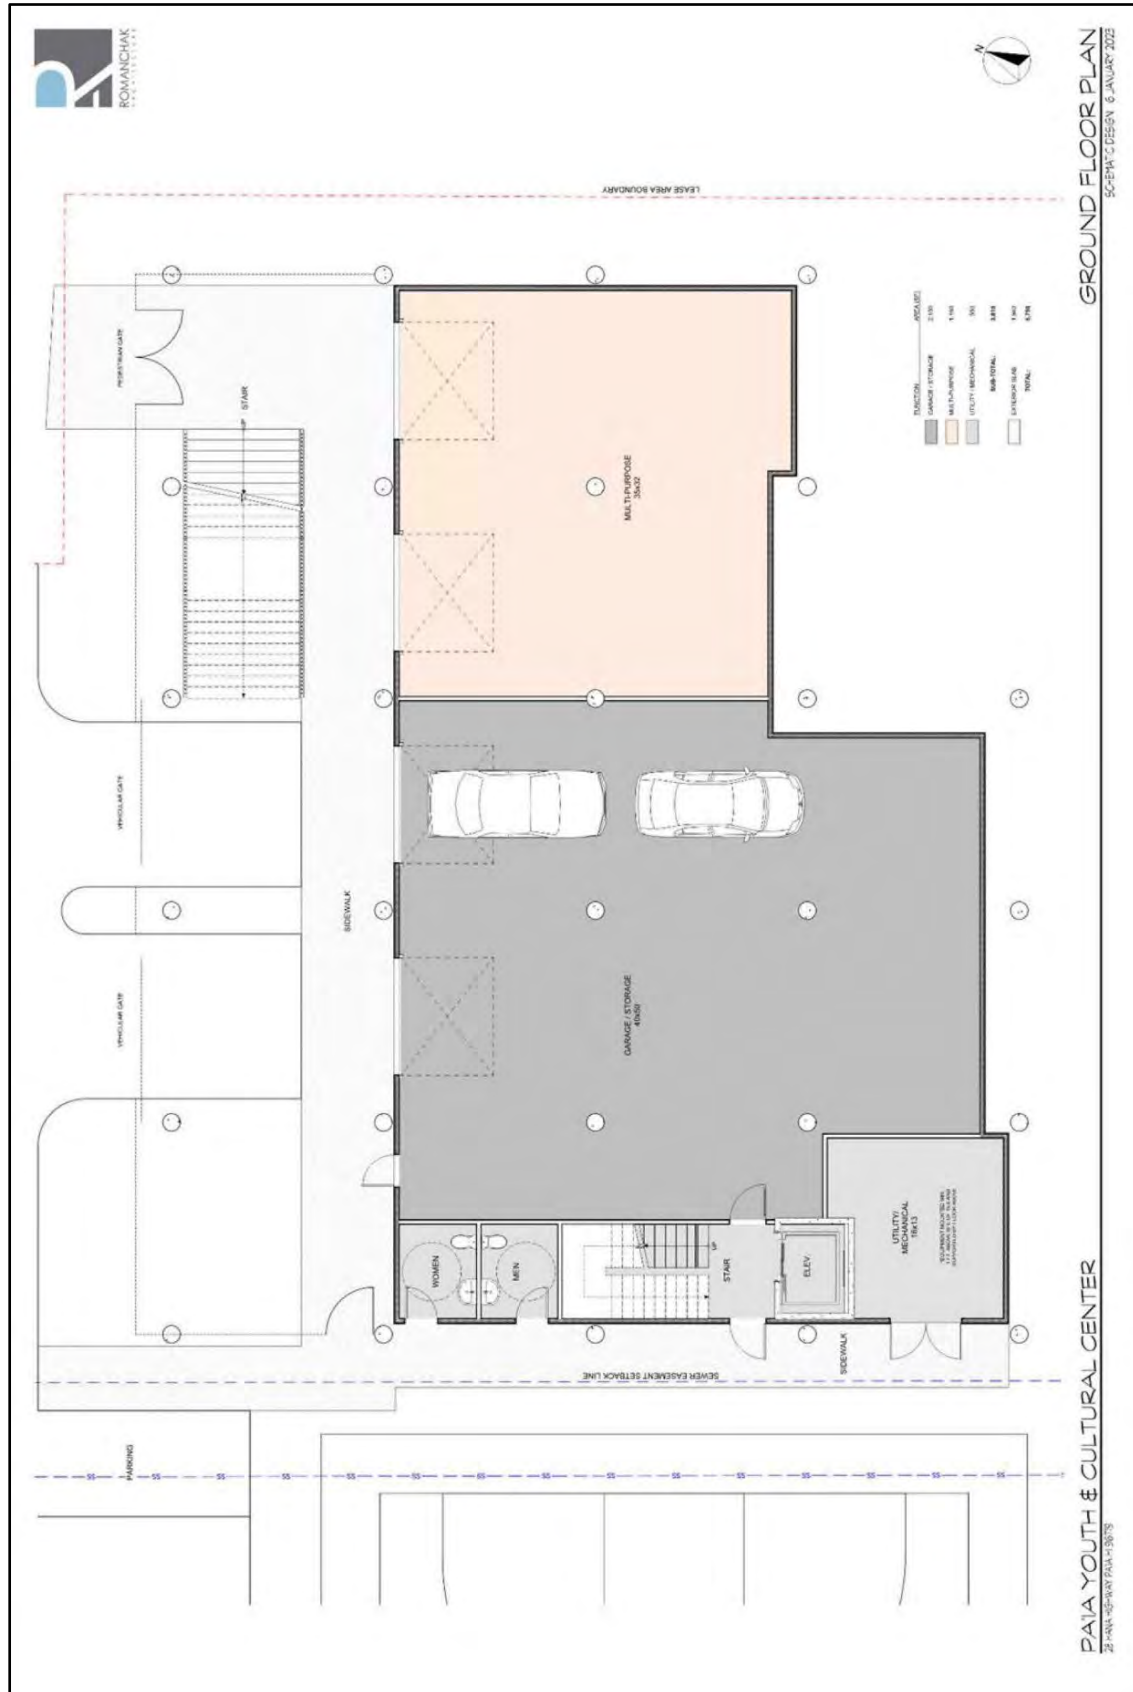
Ground floor plan for the proposed new PYCC building. Image provided by Romanchak Architecture.
